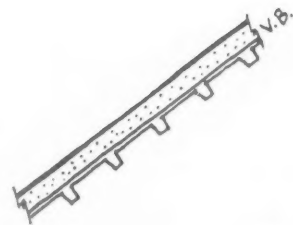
(c). Insulated roof with vapour barrier on the warm underside.—In practice the provision of a complete vapour barrier is not easy due to joints, angles, etc., but a metal deck covered with lapped roofing felt laid in bitumen is probably a good solution to this problem. The underside of the metal deck should be kept at a temperature above the dew point of the inside air if surface condensation is to be avoided; alternatively, an absorbent surface treatment may be used to deal with occasional surface condensation.
